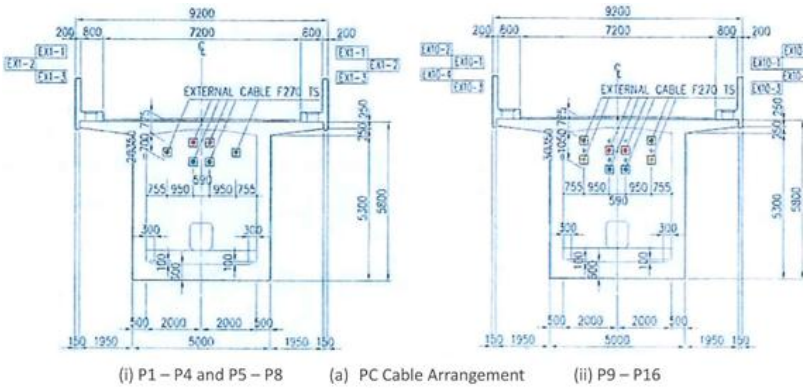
Existing 2 lane Meghna and Gumti Bridge cross section.
